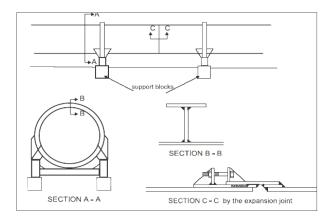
Penstock with concrete anchor blocks and expansion joints
